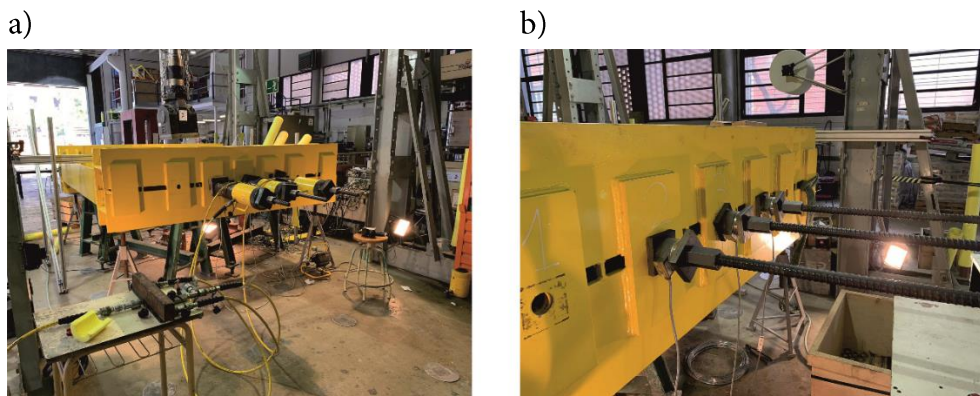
a) Jacks placed at the active anchorage. b) Passive anchorage.
